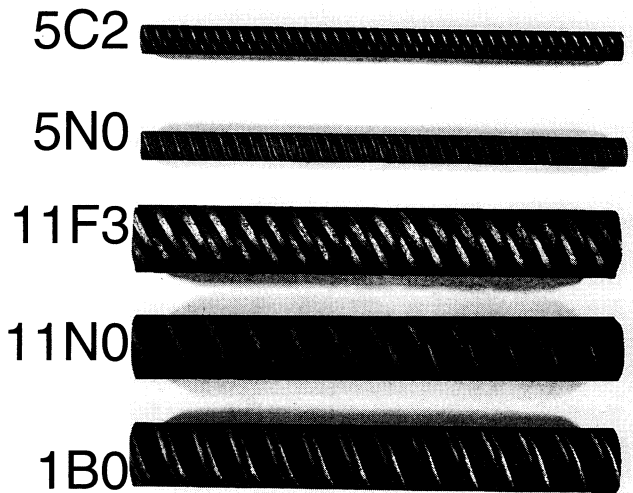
(b)—Reinforcing bar deformation patterns, No. 5 and No. 11 (16 and 36 mm) bars
